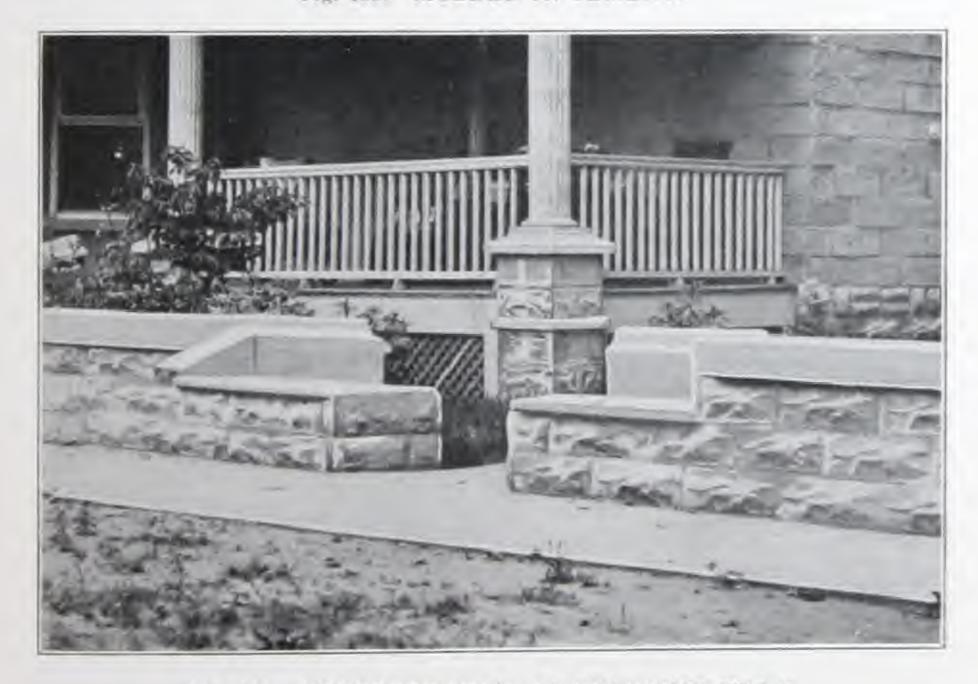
CONCRETE SEATS AT ENTRANCE WALK.
